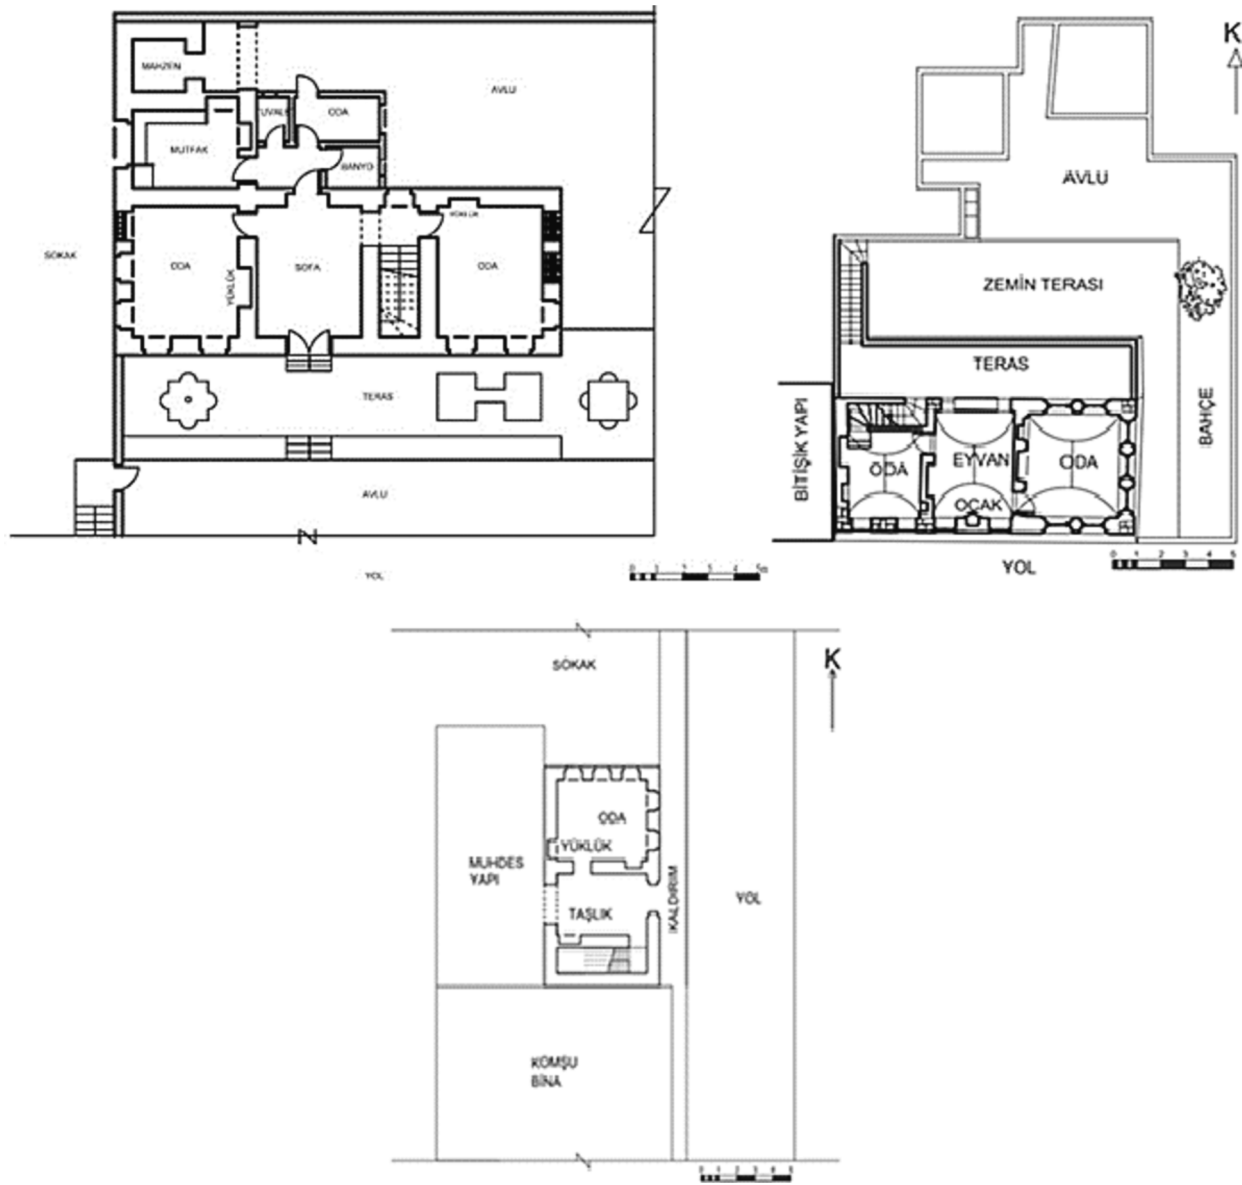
Plan types of Siirt Houses, Plan type with interior hall (a), Plan type with diwan (b), and Stony plan type (c).
